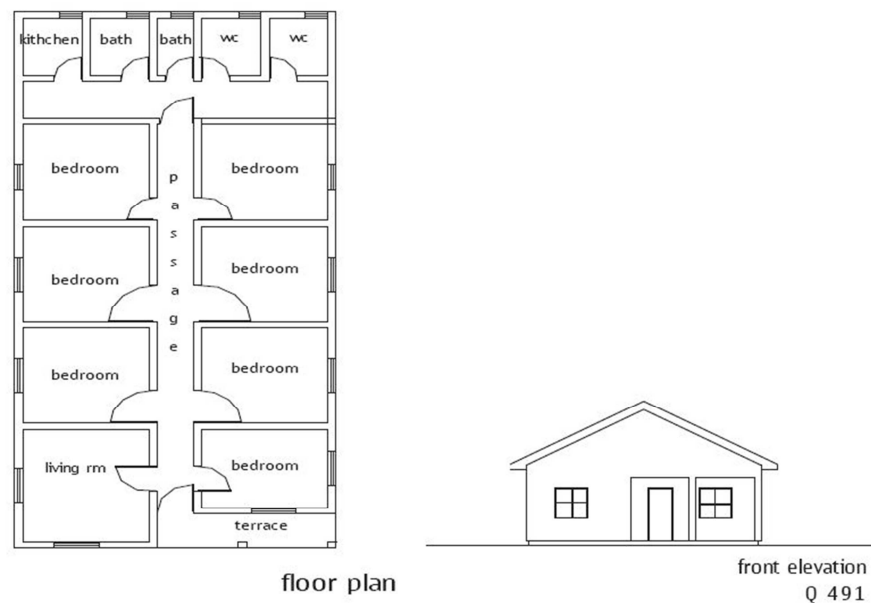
Plan and elevation of a typical house in Ogebere, Nigeria. (Source: Jaiyeoba & Aklanoglu, 2012)
